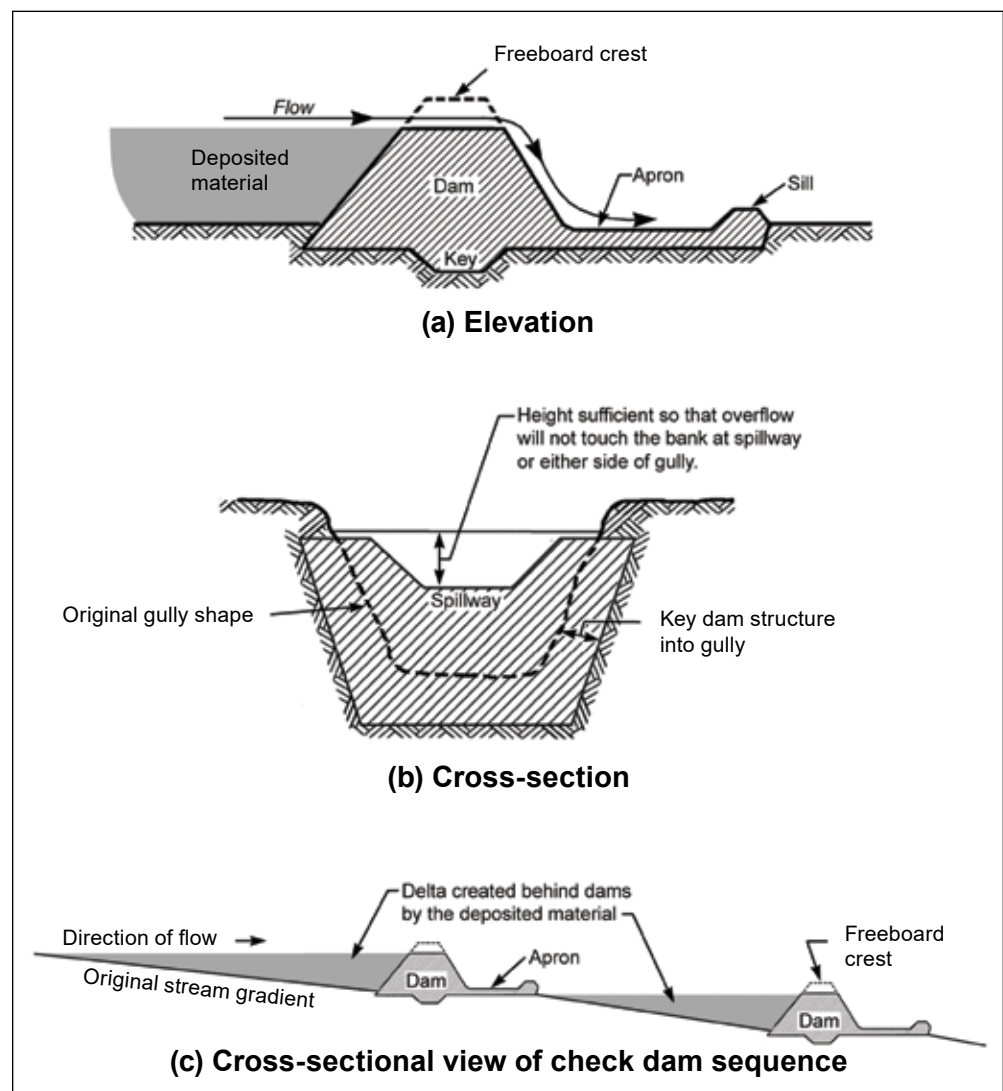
Check-dam design used to control or stabilize a gully. Note the details for keying the structure into the gully, having a U-shaped weir, and protecting the toe area against scour with other downslope structures. (Figure from Keller and Ketcheson [2015])
